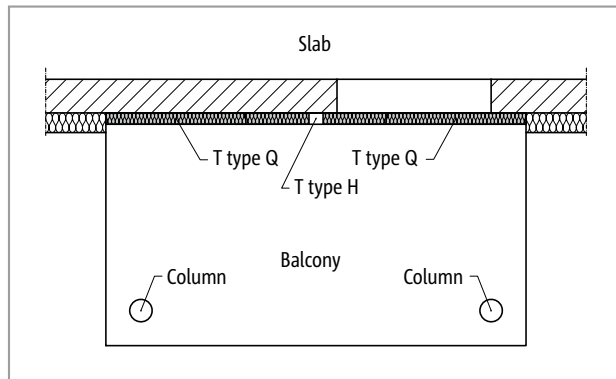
Schöck Isokorb® T type H: Balcony with column support
